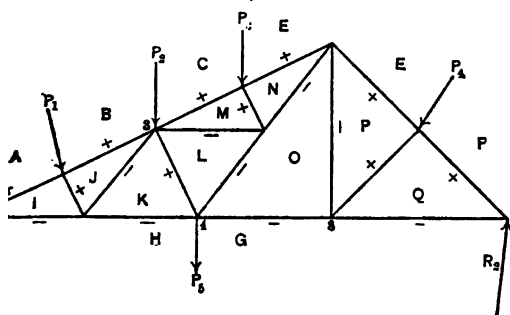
Unsymmetrical Truss. Truss-diagram
